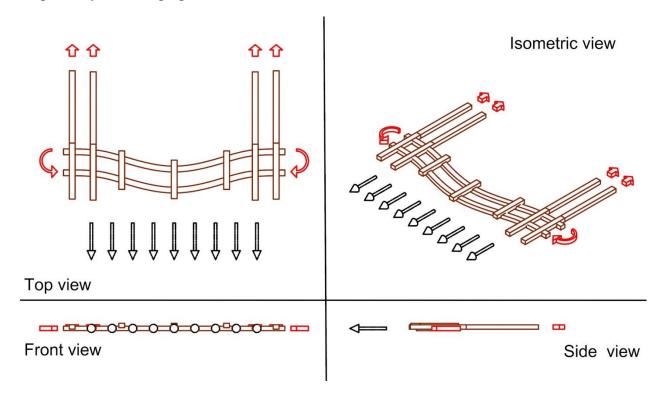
Flexible mechanism - deformed tie-timber beam chains and activation
